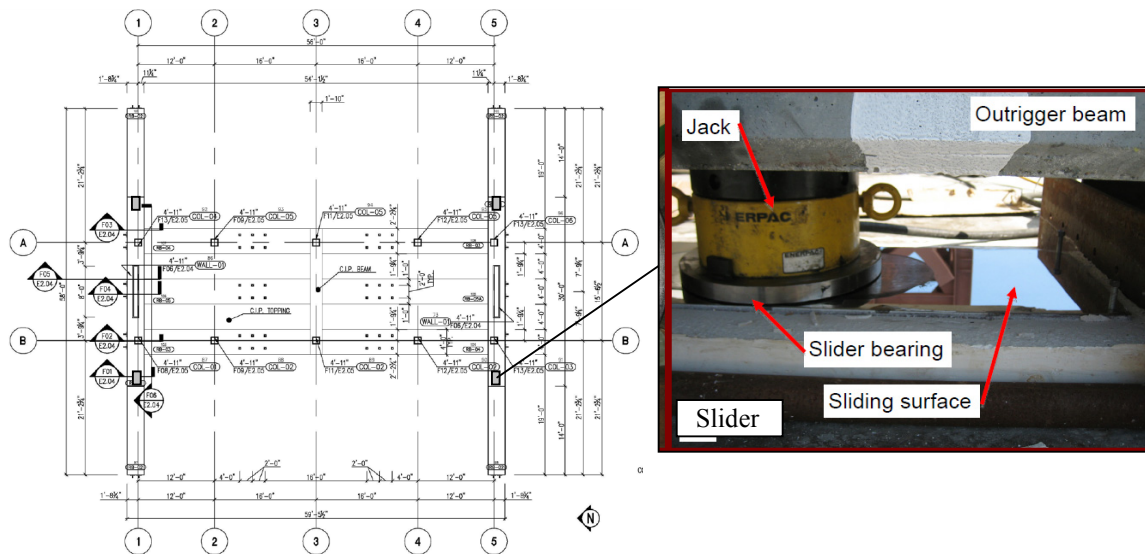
Foundation detail (modified from Schoettler 2010).
